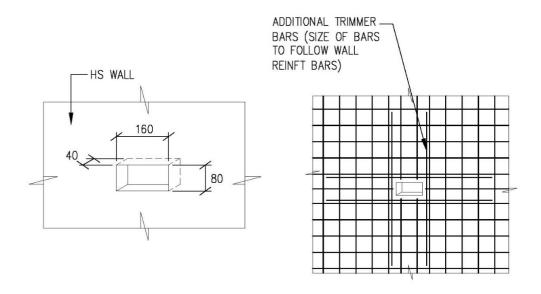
(g) TYPICAL DETAILS OF EMBEDDED CONDUIT IN HS WALL
